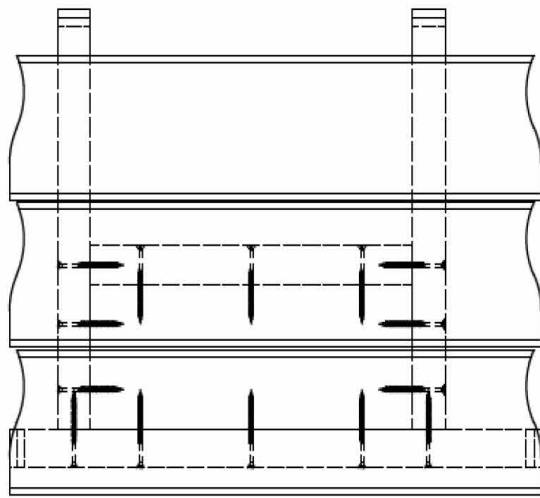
STRUCTURAL WOOD FRAMING 2" POST MOUNT
